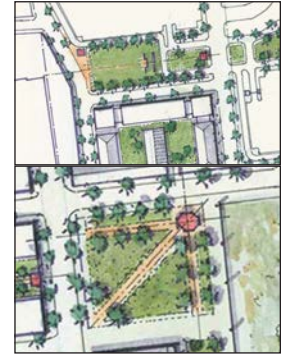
Detail of proposed Rice Mill Park and proposed Union Pier Park. Plan view of the Union Pier Terminal's waterfront concept plan.
